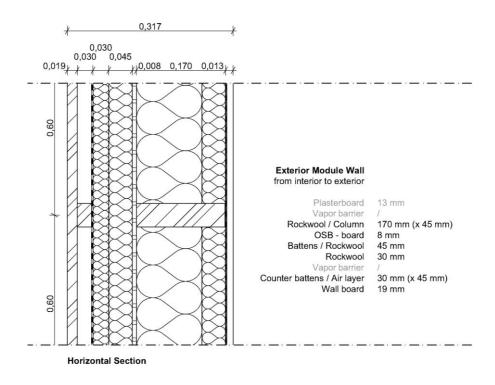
Horizontal section of exterior module wall (based on illustration by ARTEC)
